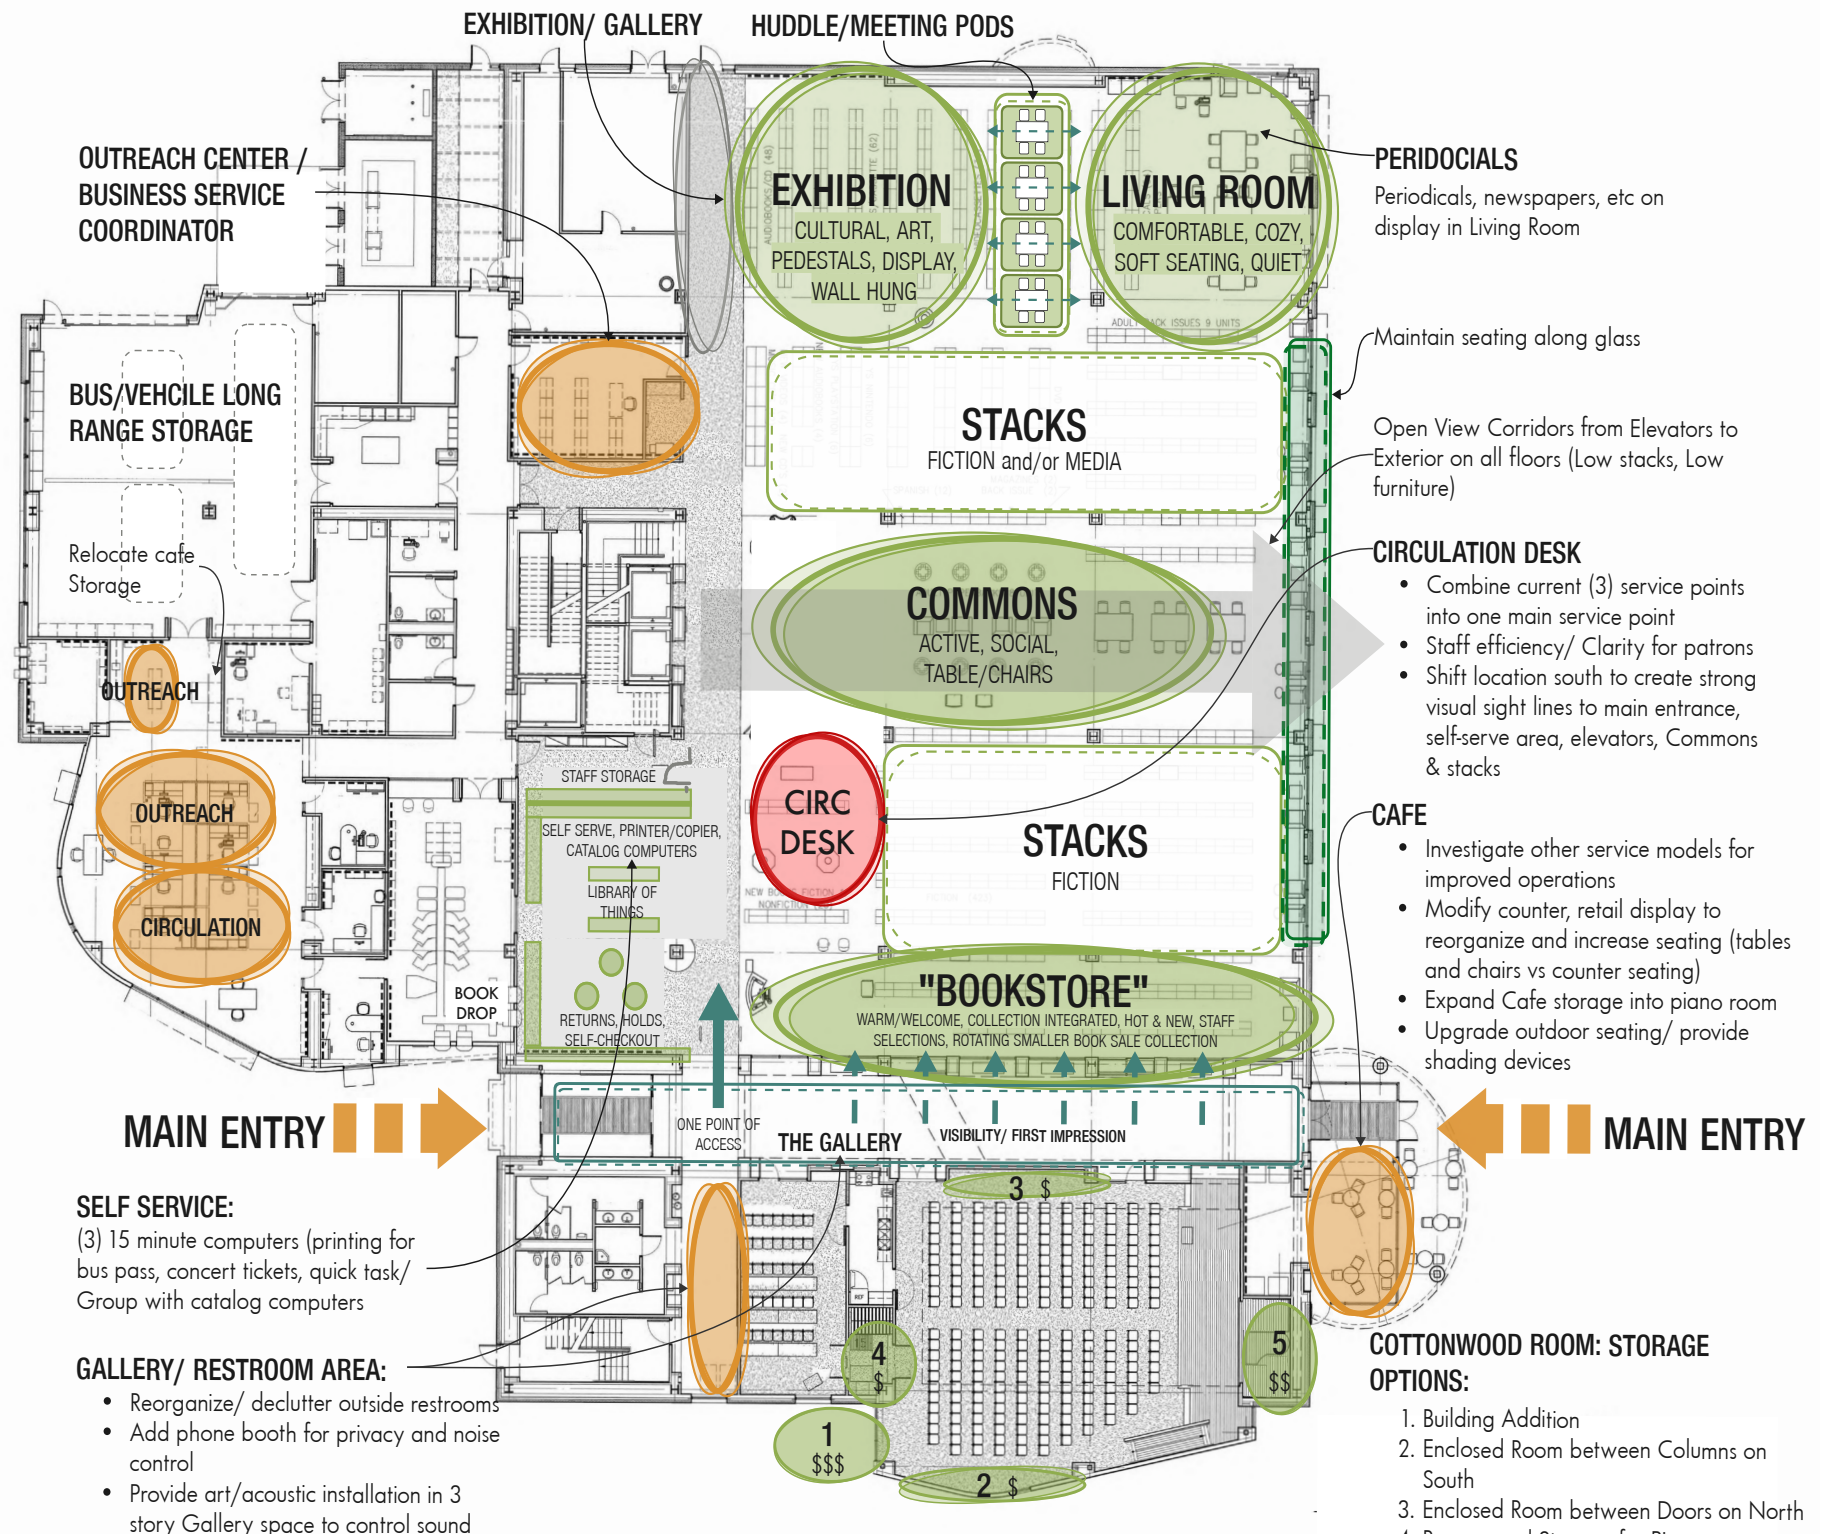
CHEYENNE BRANCH , FIRST FLOOR PLAN, OVERLAY BY JLG ARCHITECTS
